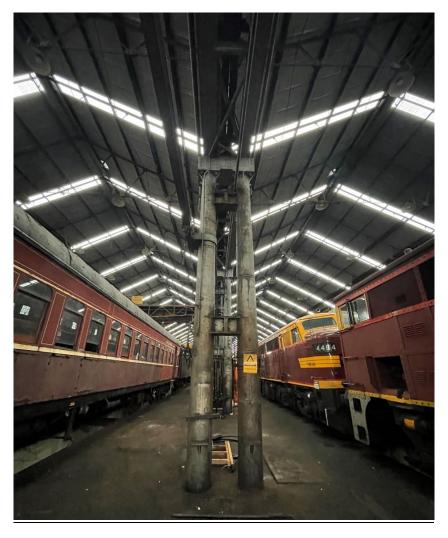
Cast Iron Columns Supporting the Roof Structure. Source: Curio Projects, 2022
